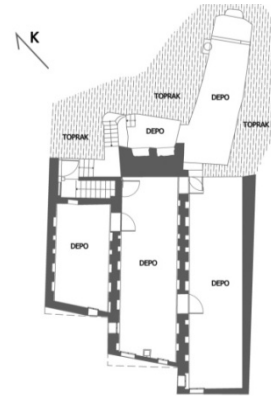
Basement Floor Plan (Yağmur, Y., 2017; Talas Belediyesi, 2010).
